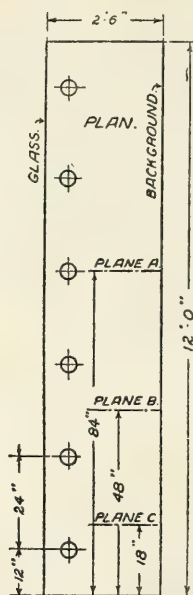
Plan of Class E window showing location of test planes and ceiling outlets.
